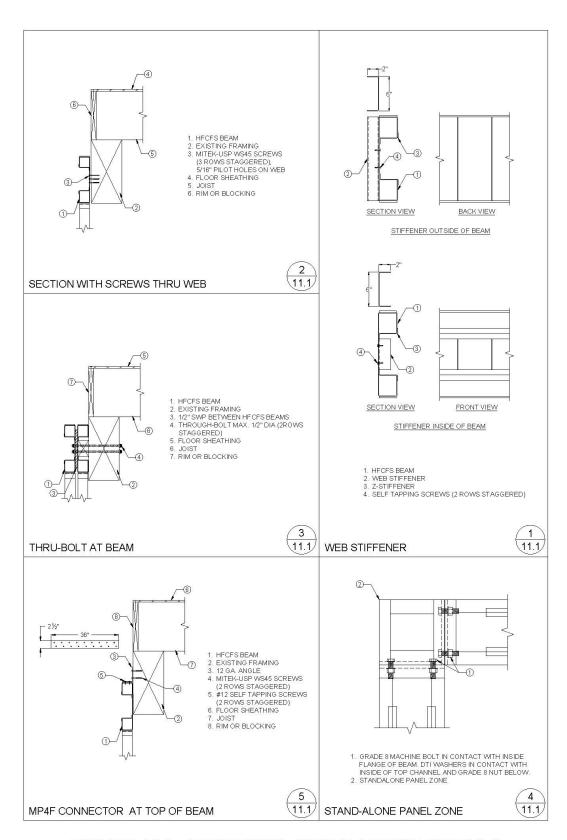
ADDITIONAL INSTALLATION DETAILS
